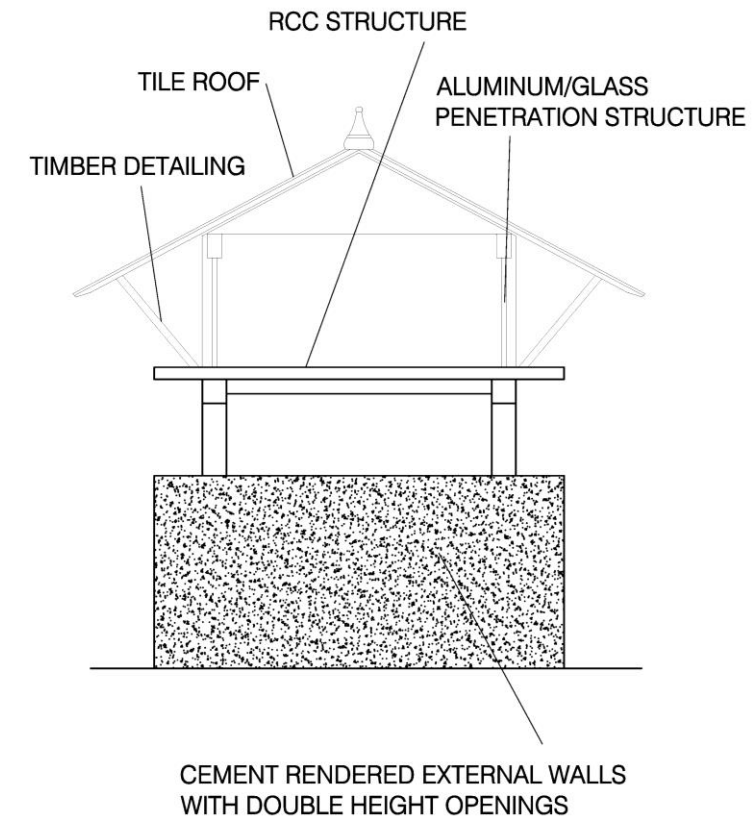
Typical Section of a Building proposed for Vantharumoolai Main Campus
